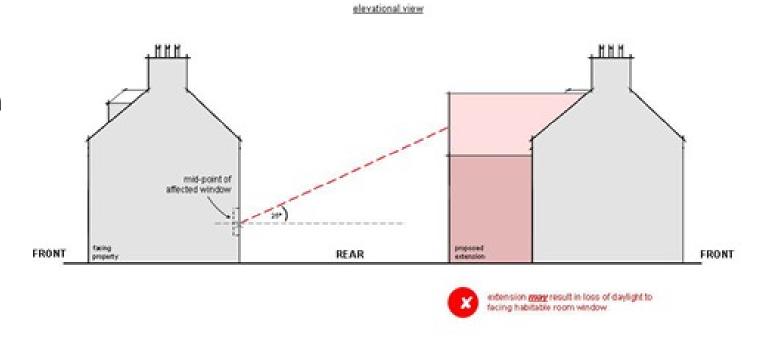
° Method, Proposed extension may result in loss of daylight to adjacent window of a habitable room
